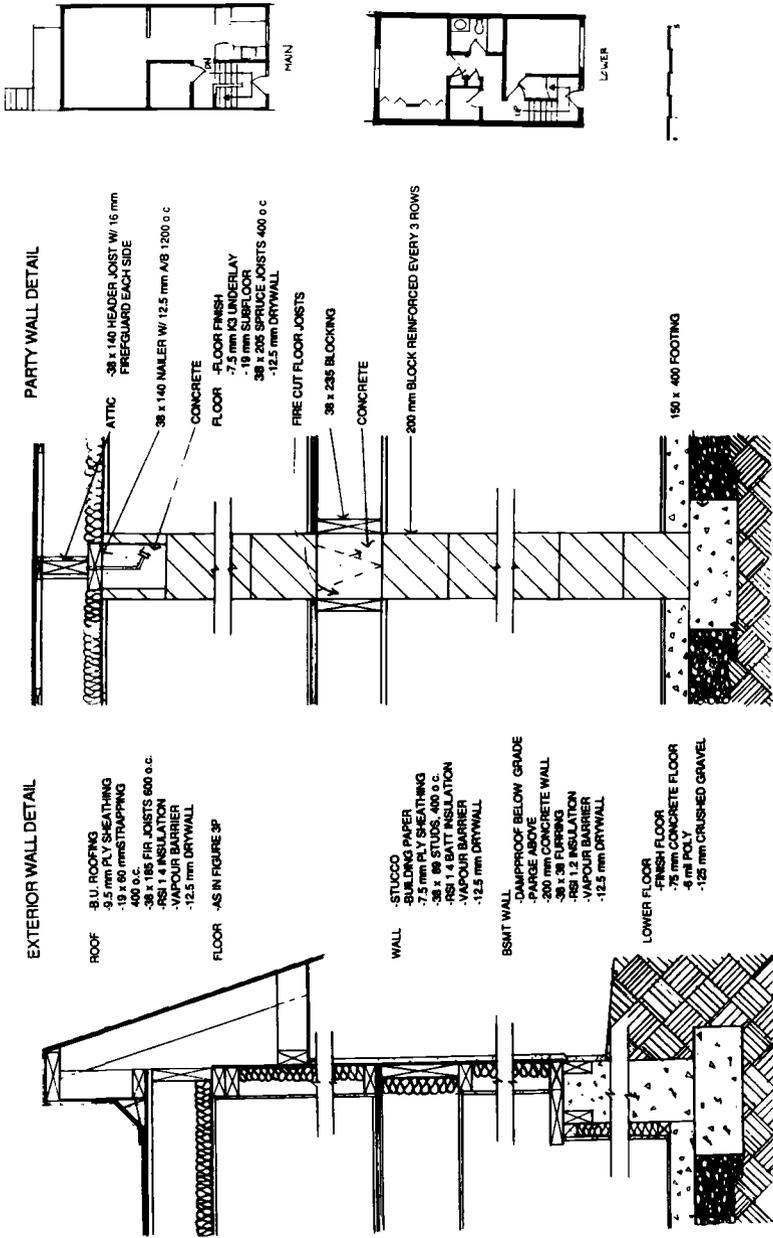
Exterior wall section, party wall section, and floor plans for Project 3.
